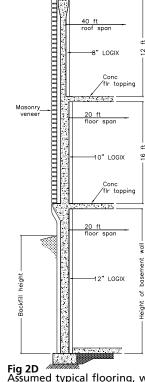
D Assumed typical flooring, wall & roof for Table 1D. Height & thickness of above-grade walls, floor & roof spans, including materials (i.e., wood frame, concrete, and cladding) can vary provided the total factored load on basement wall does not exceed 8.3 kips/ ft.
